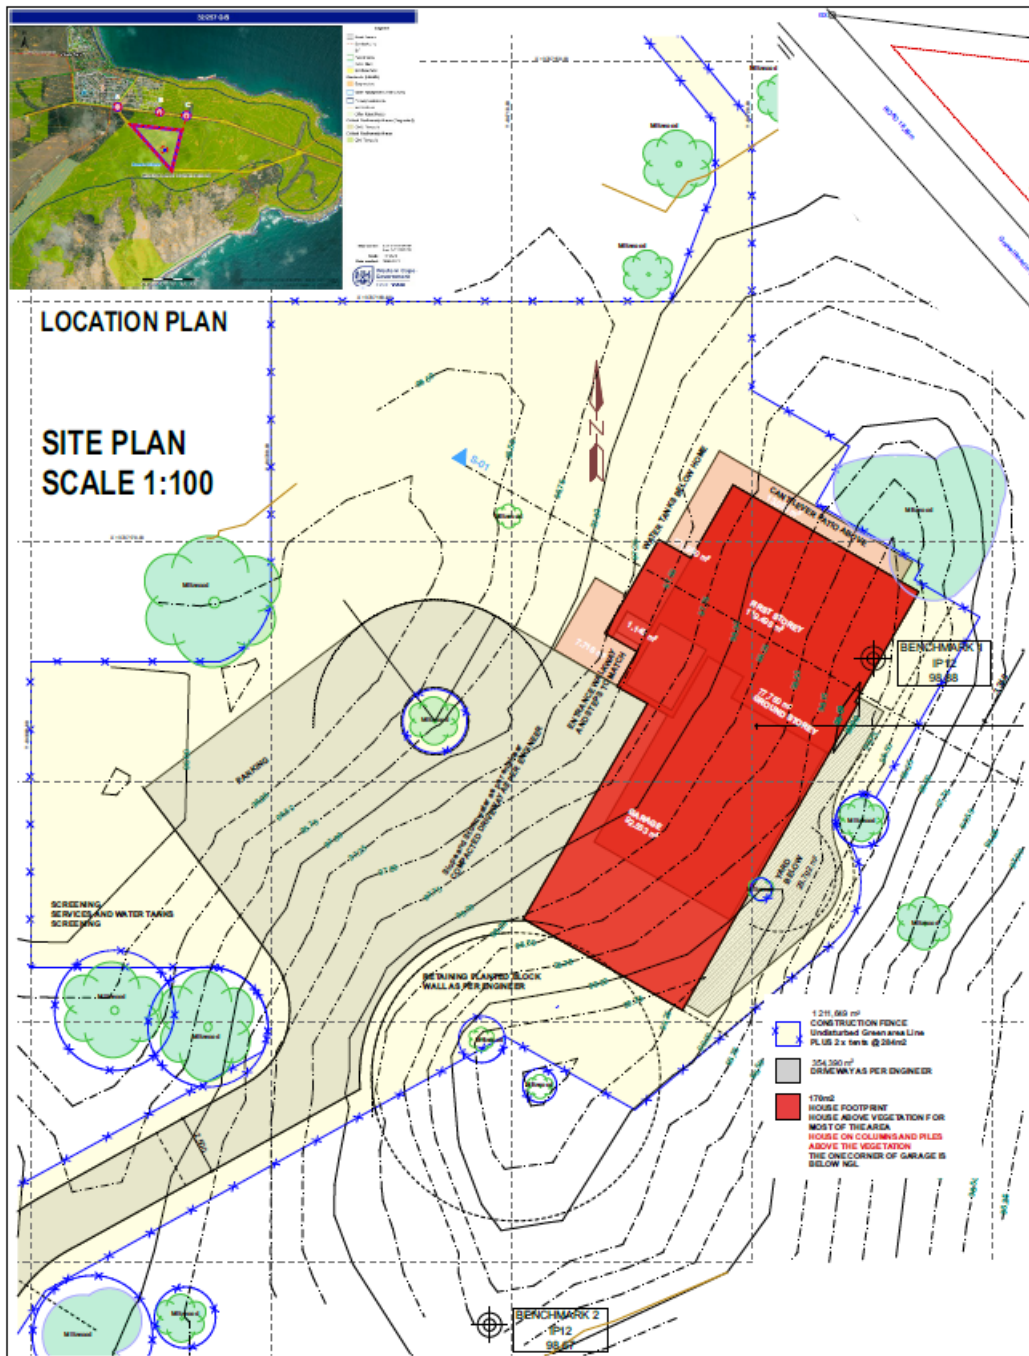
Architect plan showing the surveyed mature milwood trees that will be retained and that needs to be demarcated
